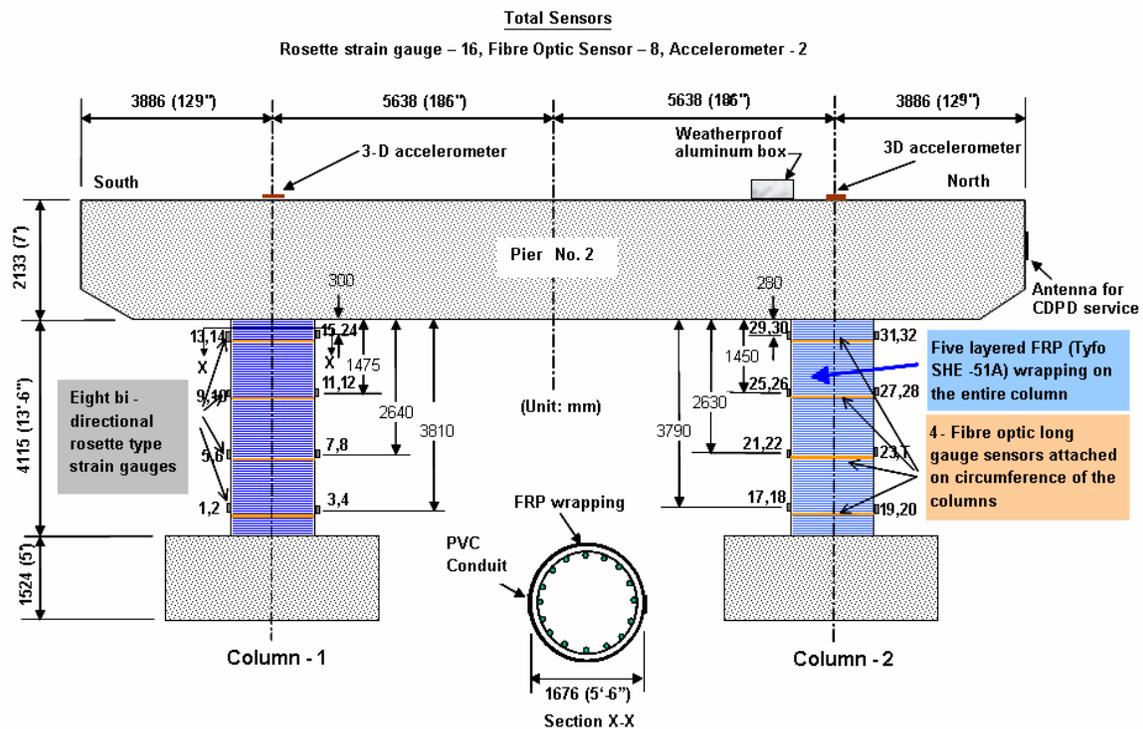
Elevation of Pier No. 2 (short columns) with sensor locations.
